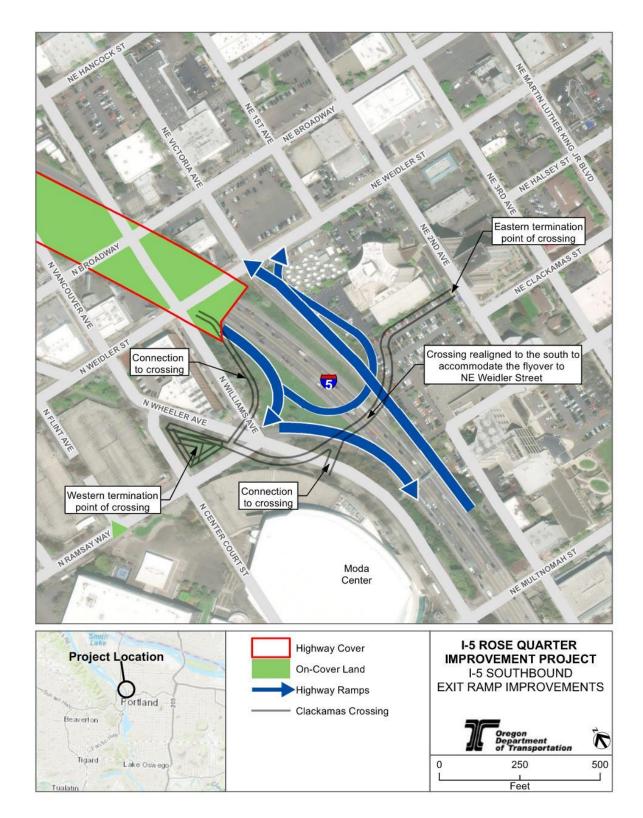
I-5 SB Exit Ramp: Traffic Splitting Eastbound from Westbound Traffic
